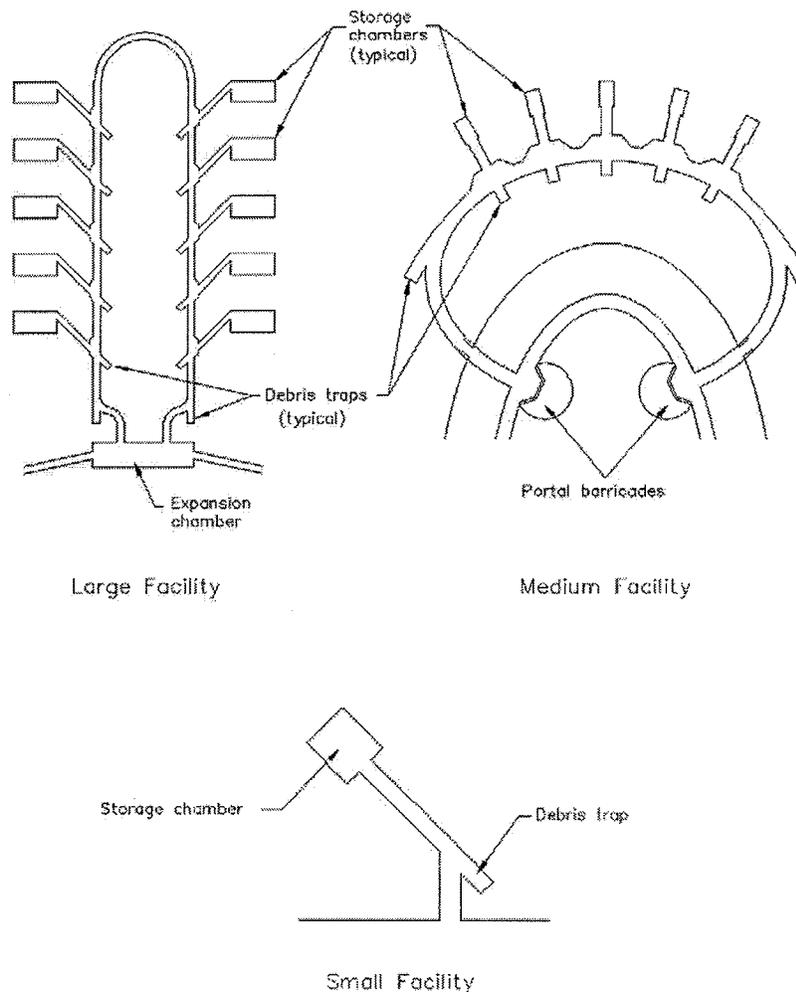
F2. Typical Underground Storage Facilities (see paragraph C5.2.3.)
